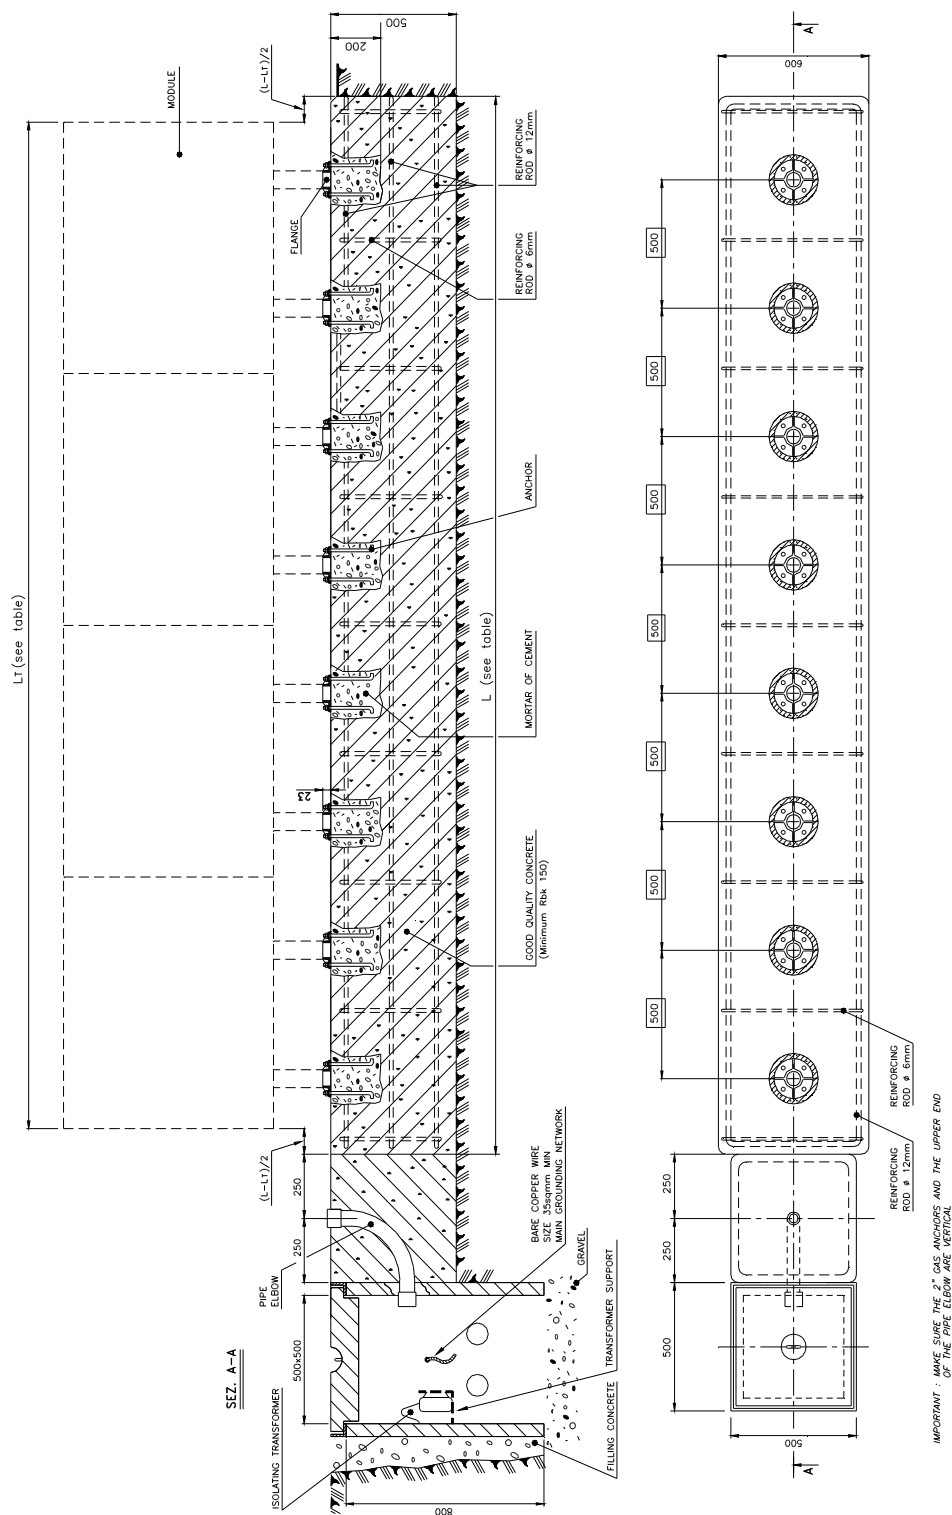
HIGS Luminous Signs - Concrete Foundation
